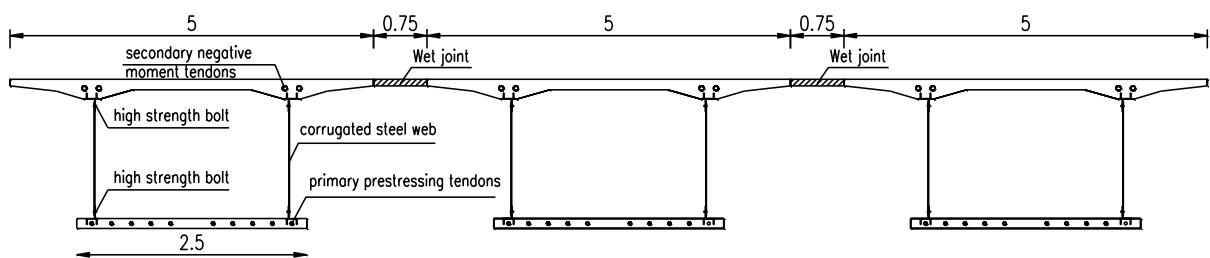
Schematic diagram of composite beam structure section - system II (Unit: m)
